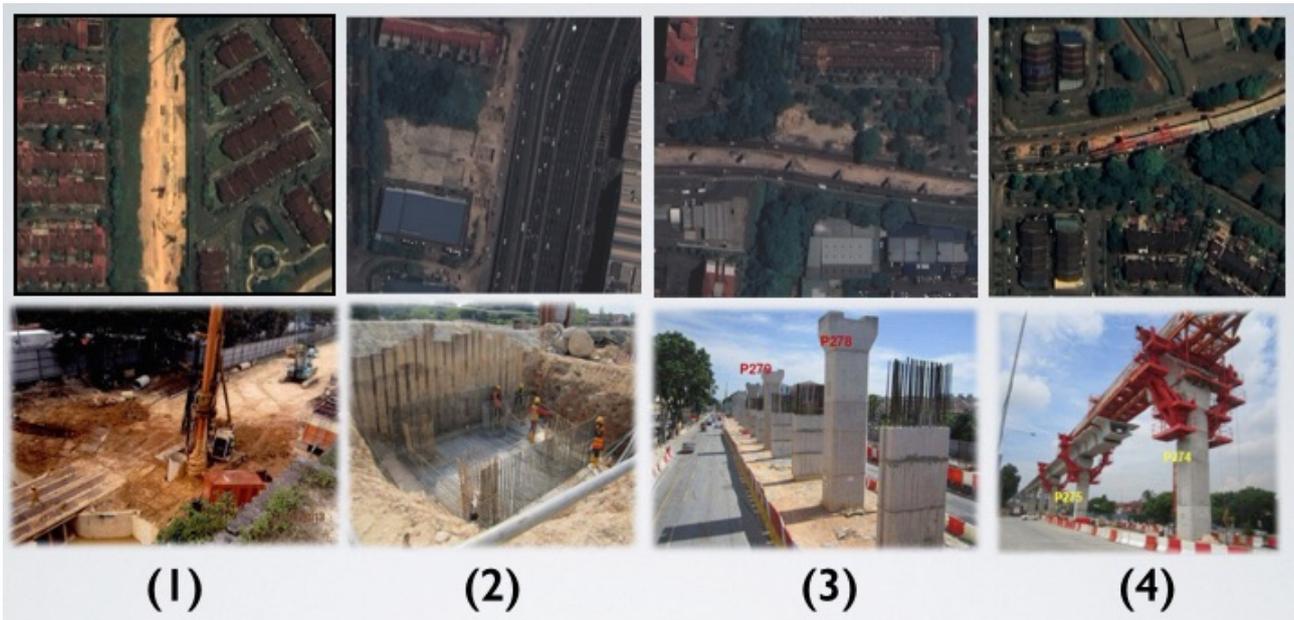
Optical image observes 4 main stages of construction: 1) Bored pile platform and activities 2) Pile cap construction 3) Pier works and pier head construction and 4) Segmented Box Girders (SBG) launching and post-tensioning activities
